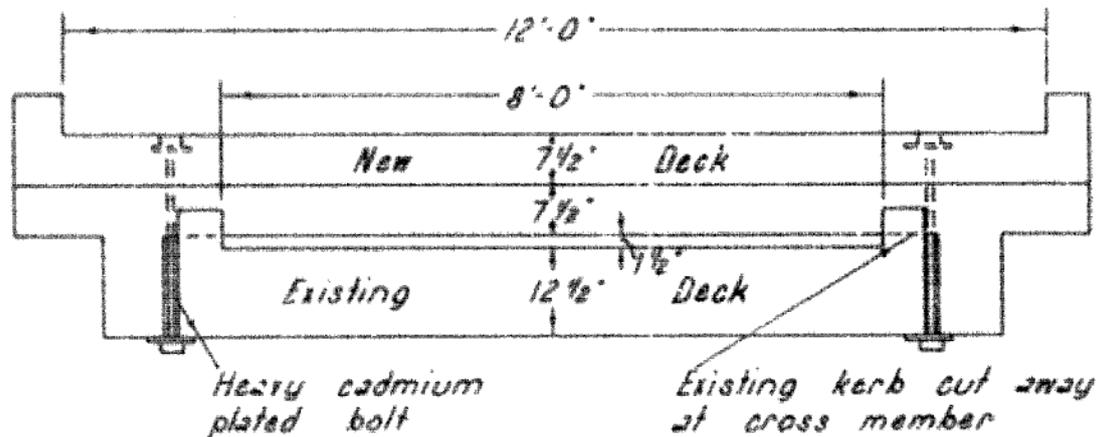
Cross-section of the widened bridge following the 1961 widening works
